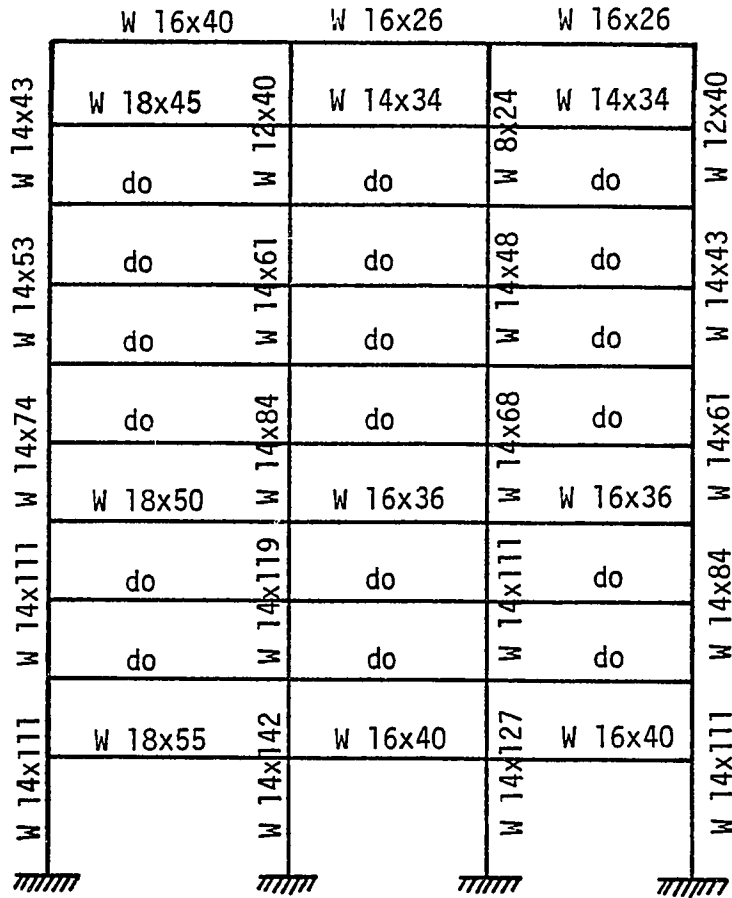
Beam and Column Sections for Lehigh Frame B
